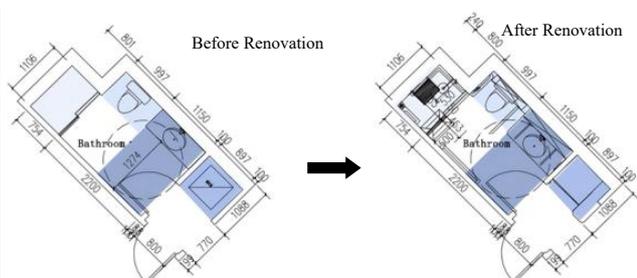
Floor Plan of the Bathroom Adjacent to the Kitchen
